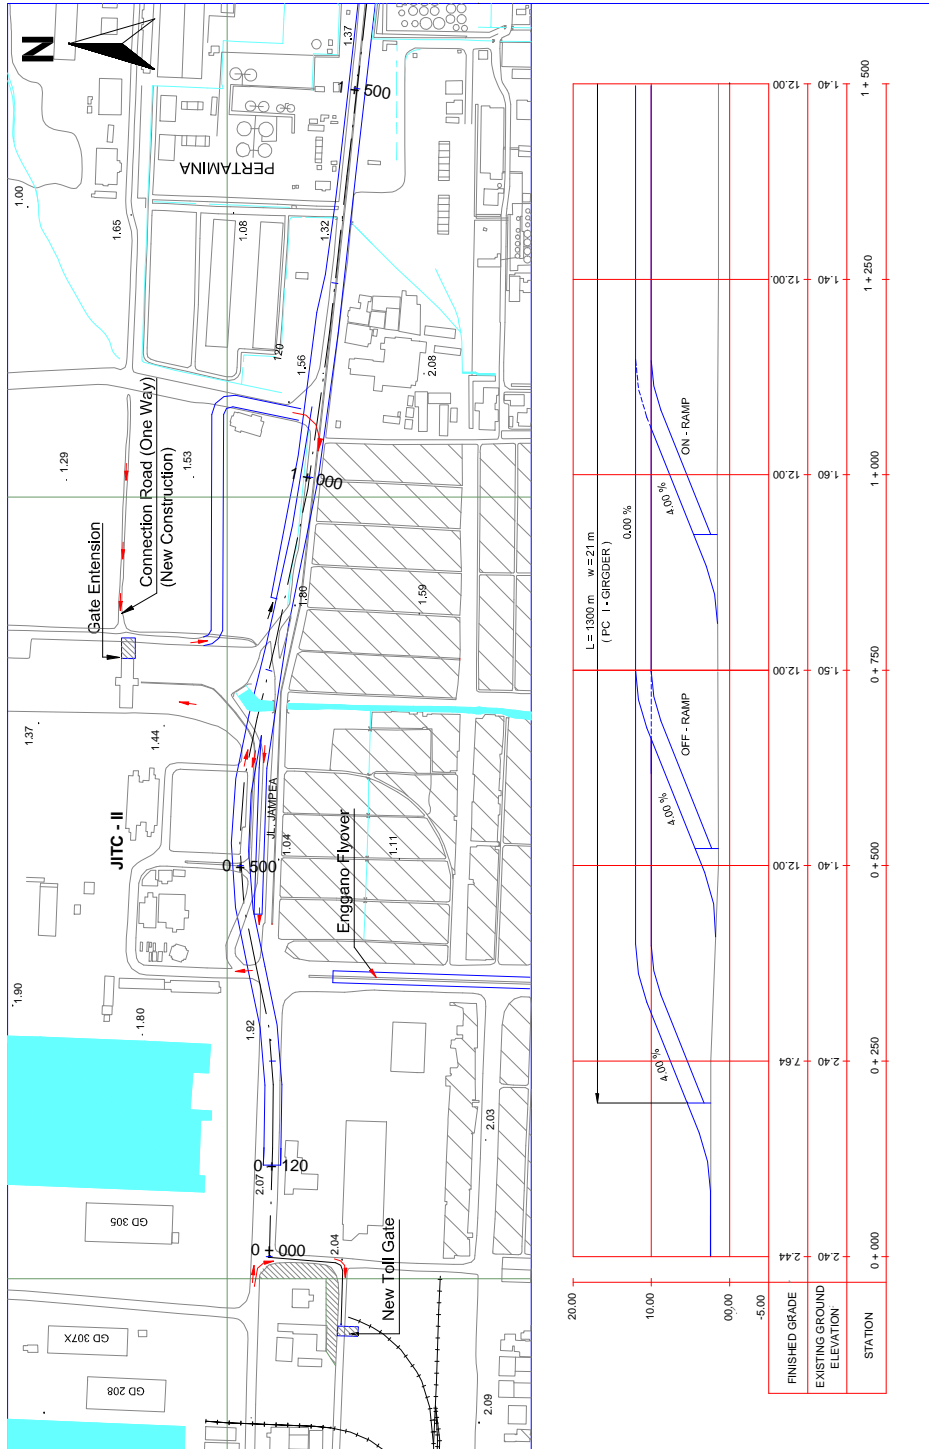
A-2 Eastern Access Port Highway Plan and Profile
